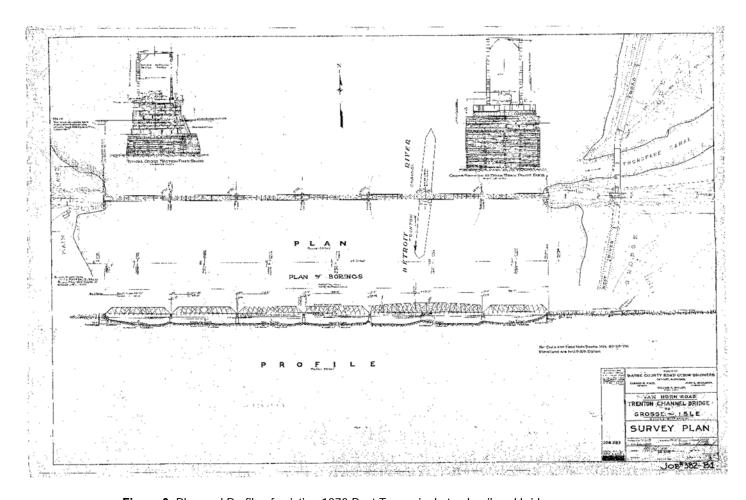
Plan and Profile of existing 1873 Post Truss single track railroad bridge
